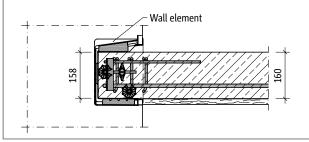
Schöck Tronsole® type Z: Wall element as stay-in-place formwork
